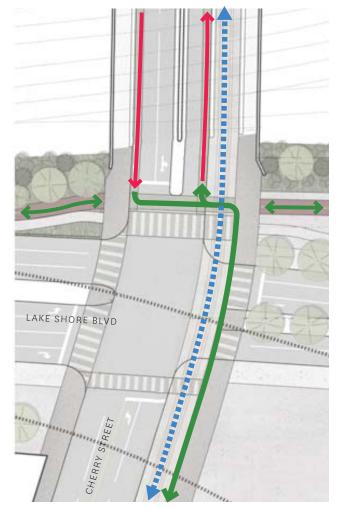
Detail Plan - Bike Lane Transition at Cherry Street and Lake Shore Boulevard Legend
